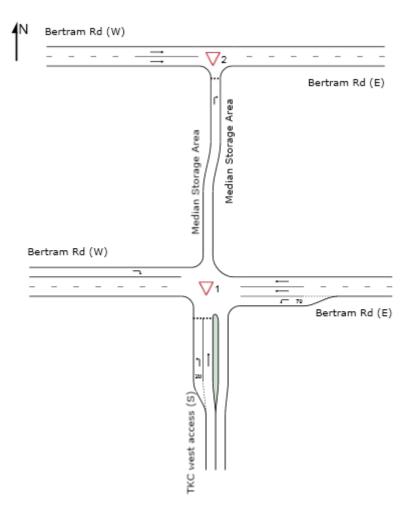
Bertram Rd / Western access intersection layout analysed in SIDRA
